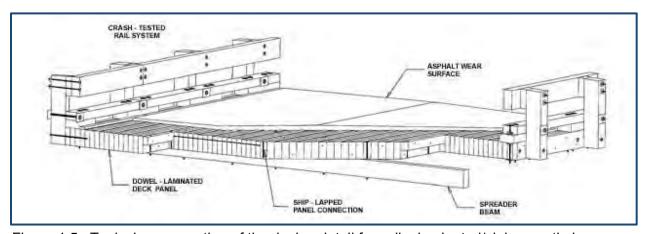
Typical cross-section of the design detail for spike laminated/slab span timber bridge. Photo courtesy of Wheeler Lumber, LLC.
